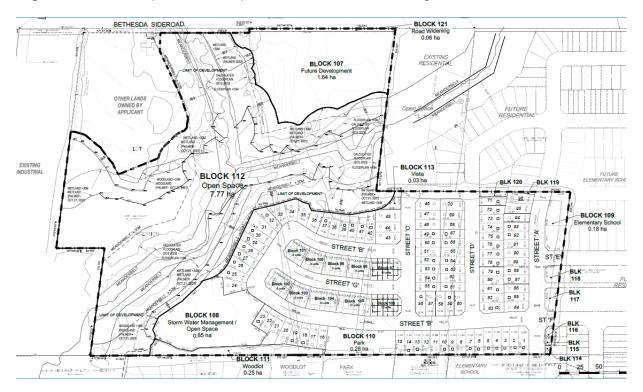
, below depicts the Proposed Draft Plan indicating the Blocks.
